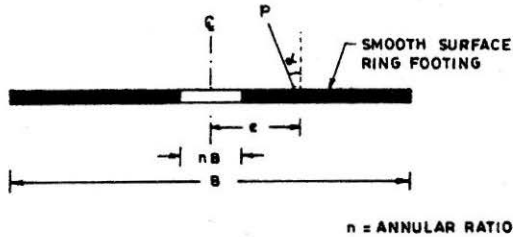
Ring Footing Subjected to Eccentric Inclined Load
